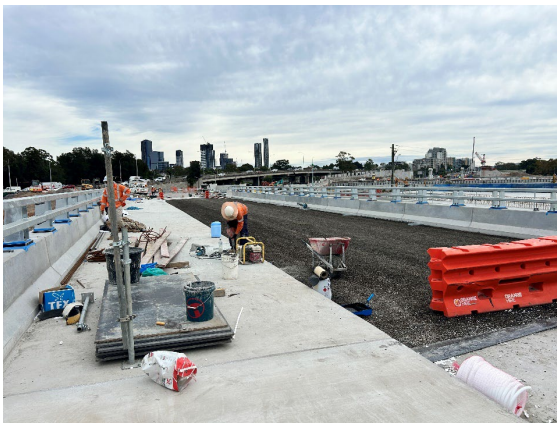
Clyde MSF Site – New Unwin Street bridge construction
